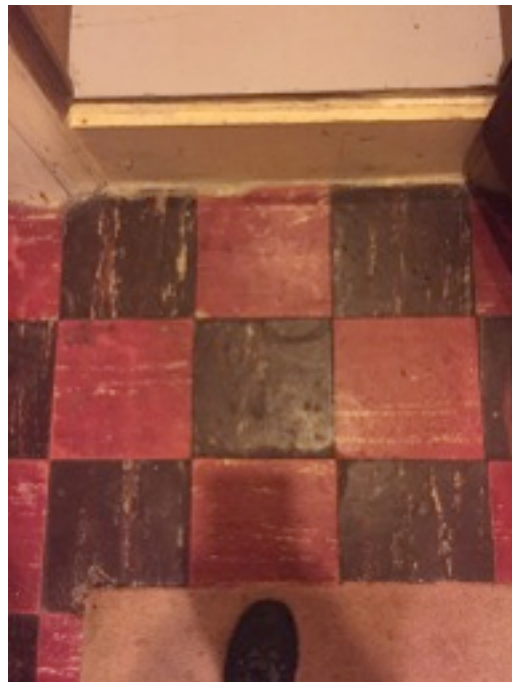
Asbestos-containing vinyl floor tiles in the Basement.
